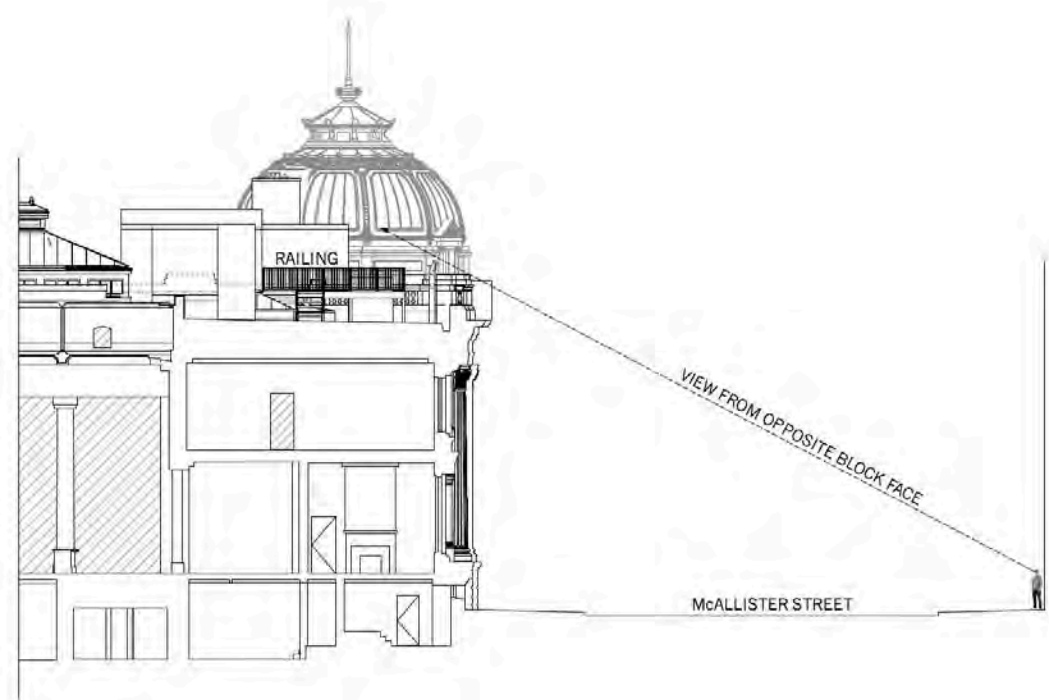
The railing, both the previously approved and the one on the proposed expanded deck area will not be seen from the McAllister Street right-of-way. For the railing to be seen, one would need to be over 420' away from the face of the Hibernia Bank Building.
